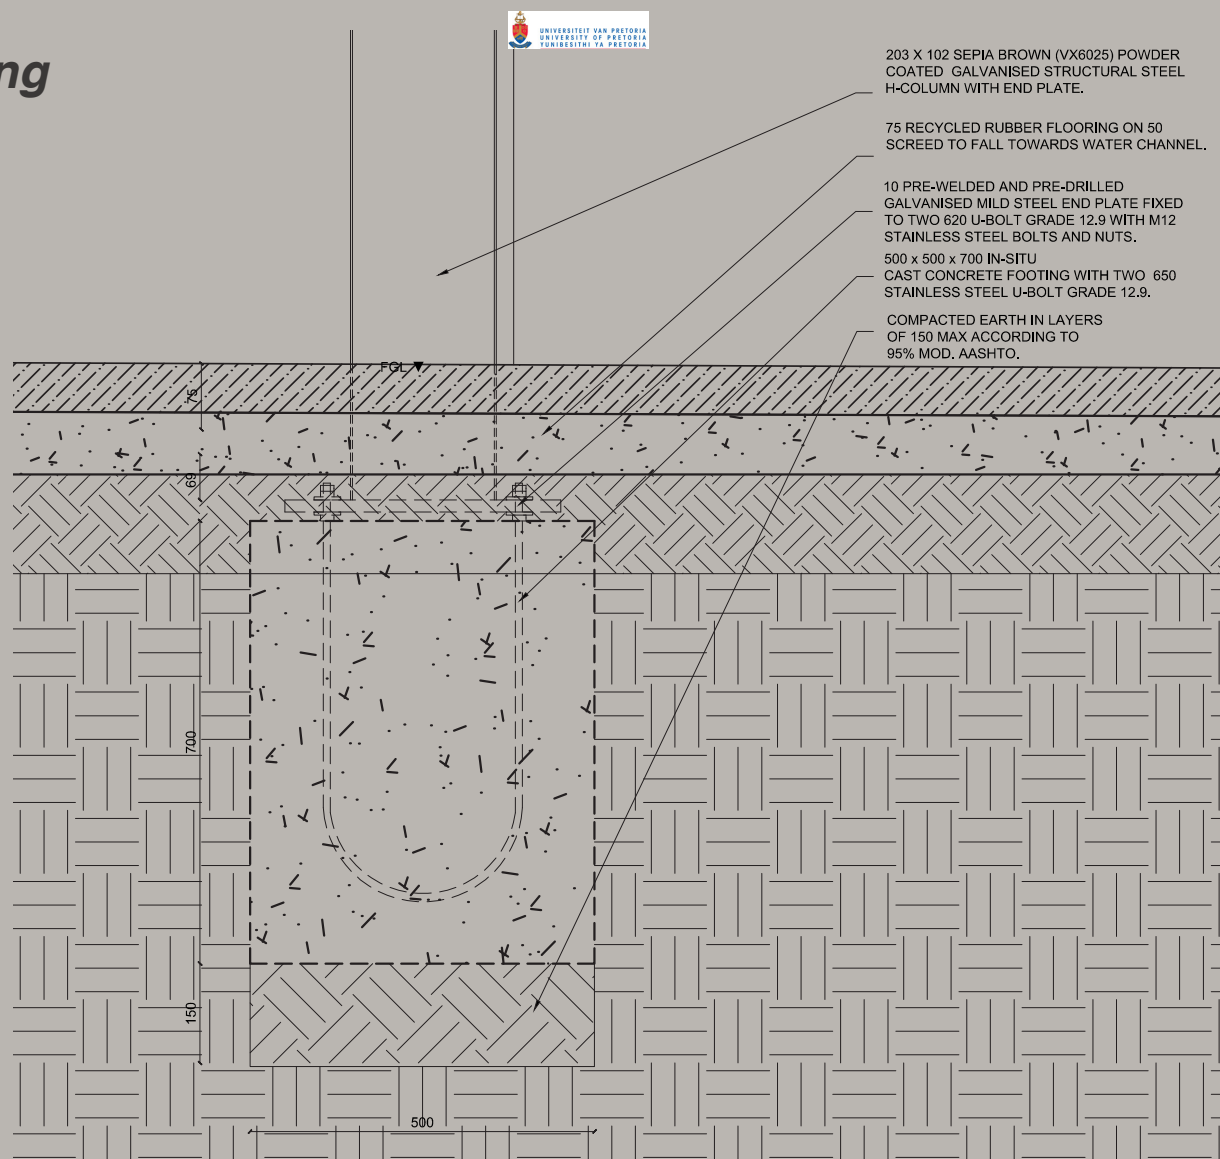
Detail Section (1:10) of I-Beam Footing and Courtyard Floor Finish (Author, 2014).
